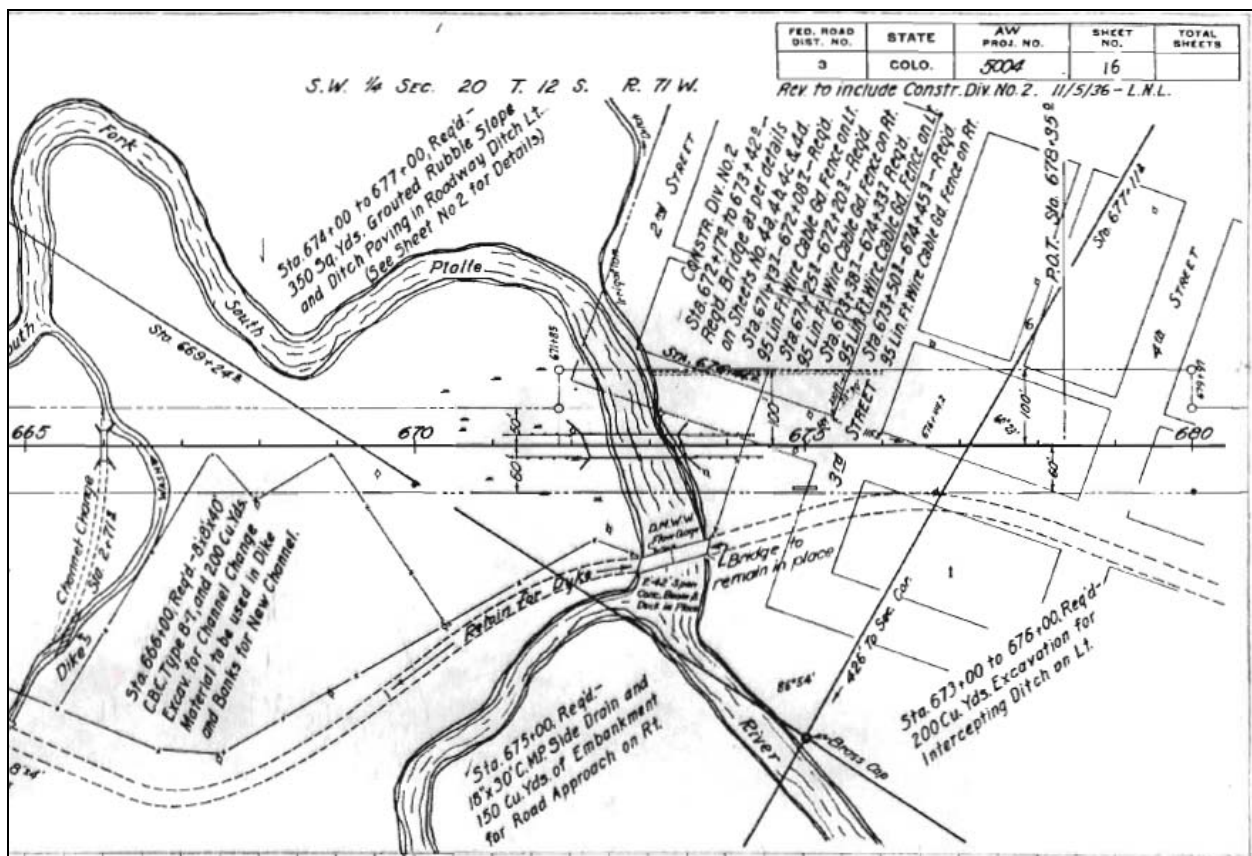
Detail of Plan and Profile of State Highway No. 4 realignment.
